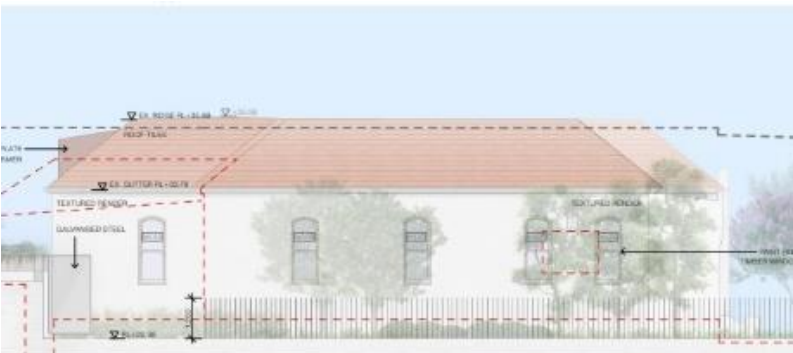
The new wing of the western elevation of 41 Toxteth Road will be roofed with traditional Marseilles tiles.
